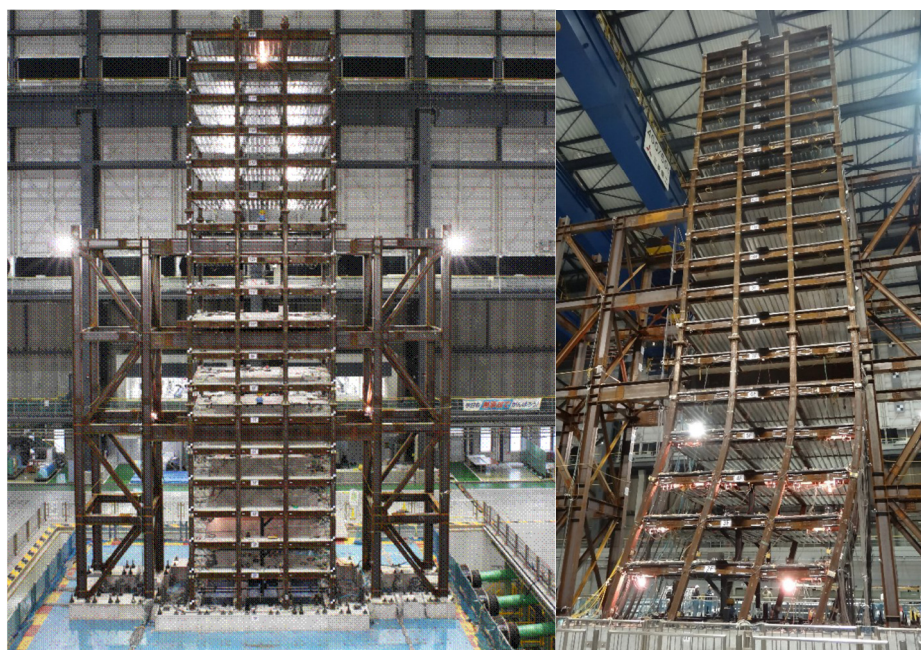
Overview of a 1/3-scale 18-story steel building structure (left) and collapsed situation of lower stories (right).
